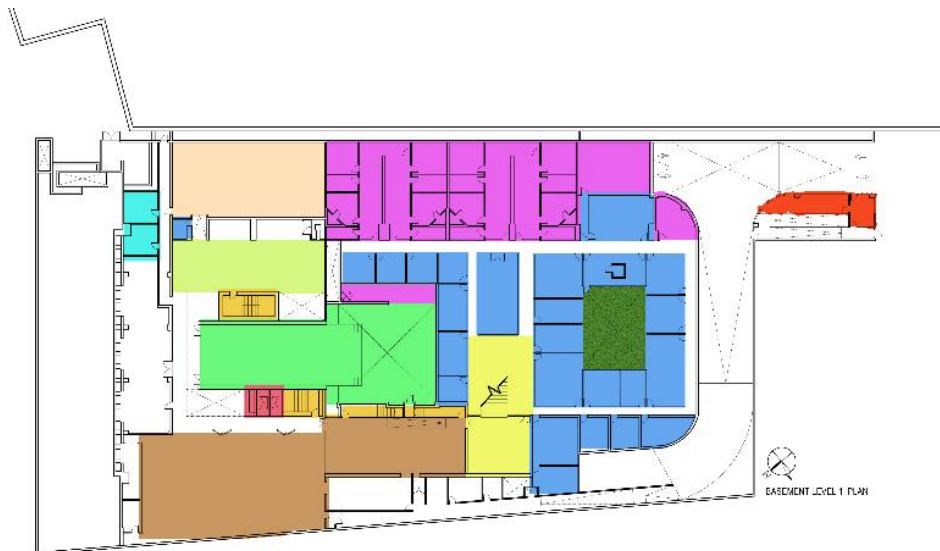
Basement Level 1 Floor Plan redrawn from the original copy.
